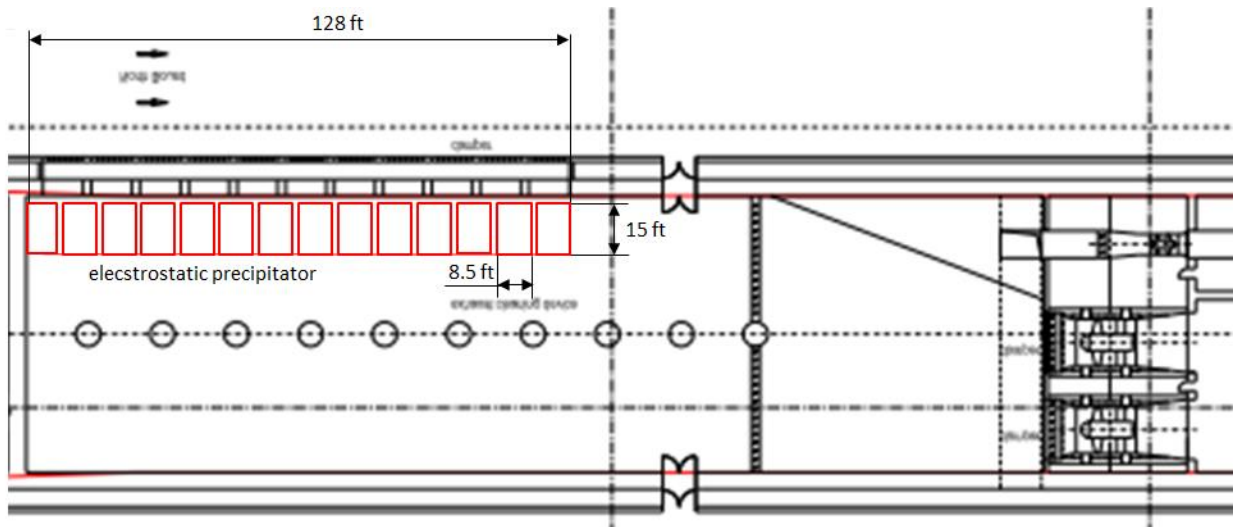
Spacing of EP Air Cleaning Equipment, Portal Building North, Plan View
